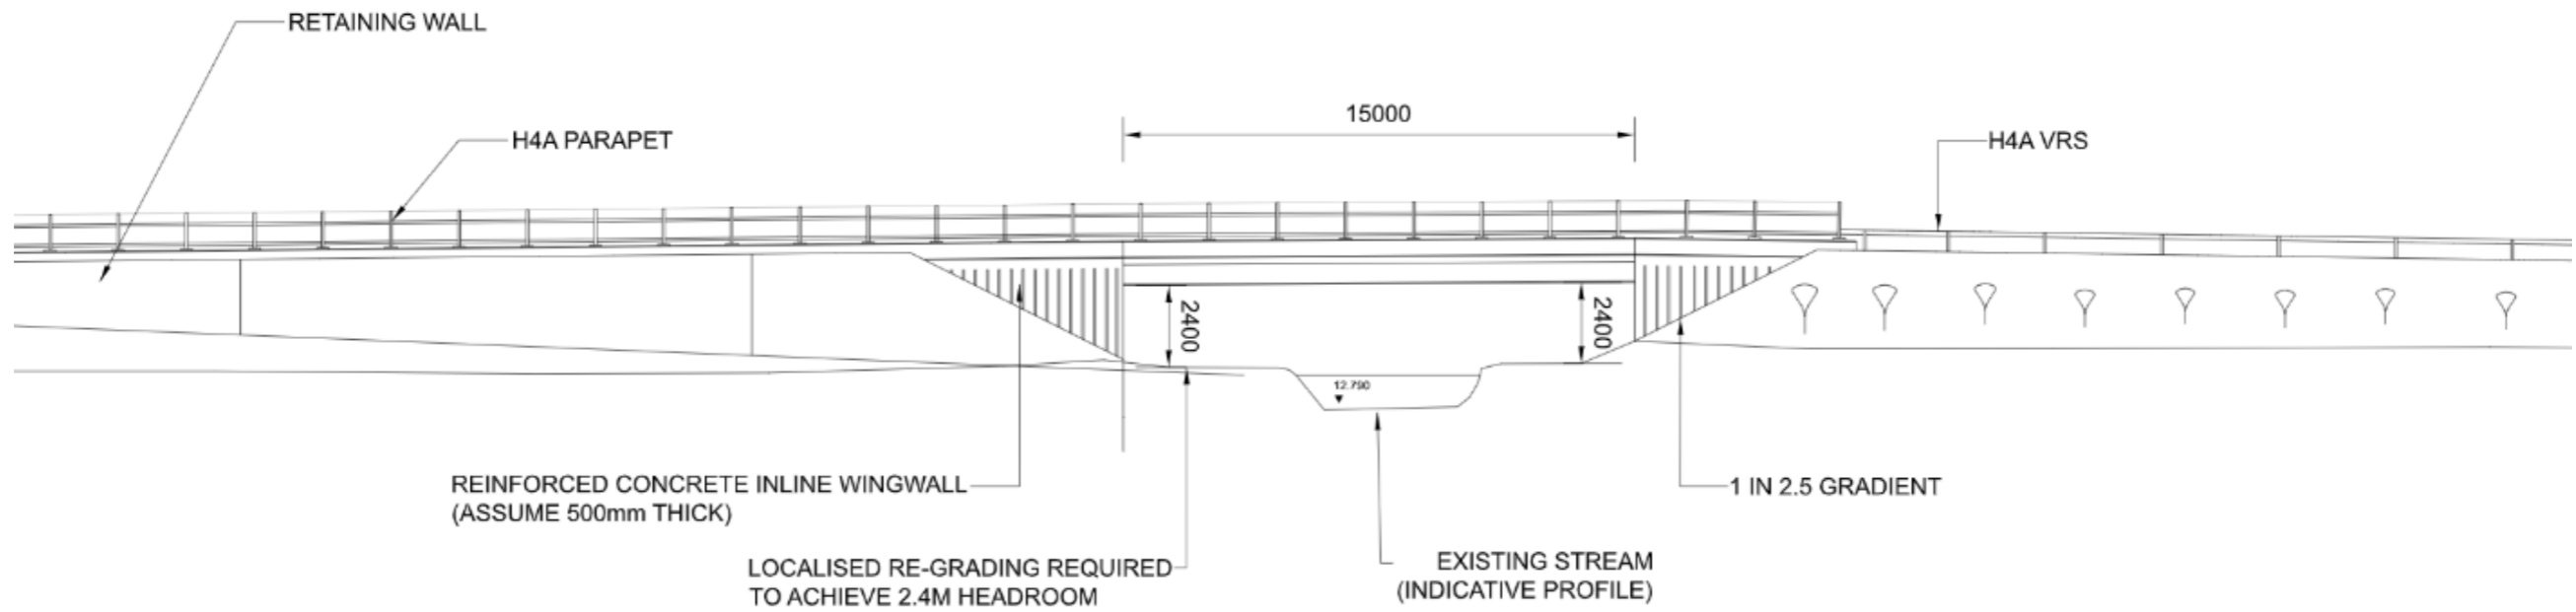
Elevation of the proposed Hobson's Conduit Bridge
